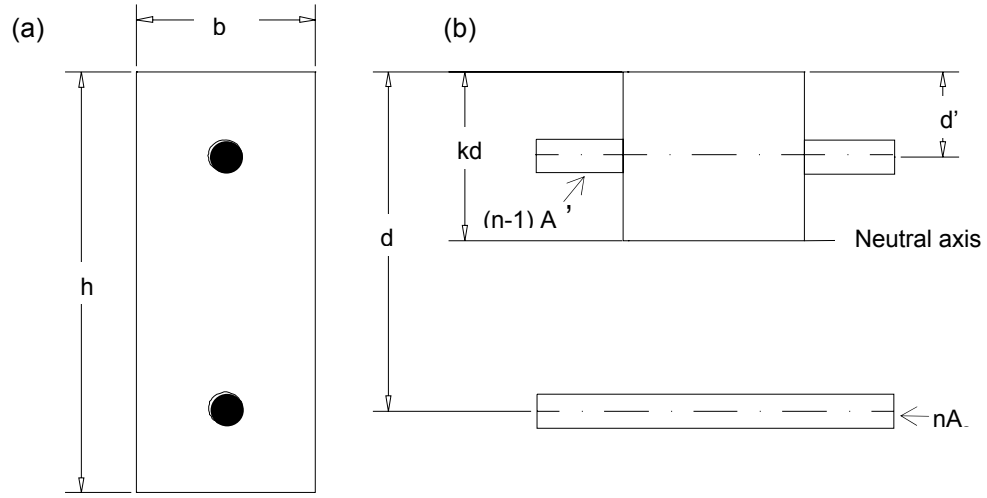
Typical notations used for: (a) a reinforced concrete section; and (b) a transformed concrete section.
